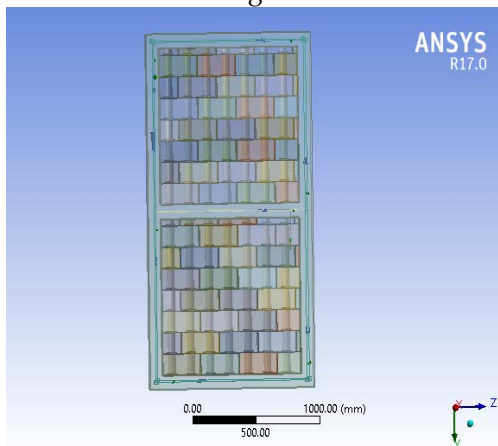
CAD model of frame infilled with circular groove interlocking blocks
